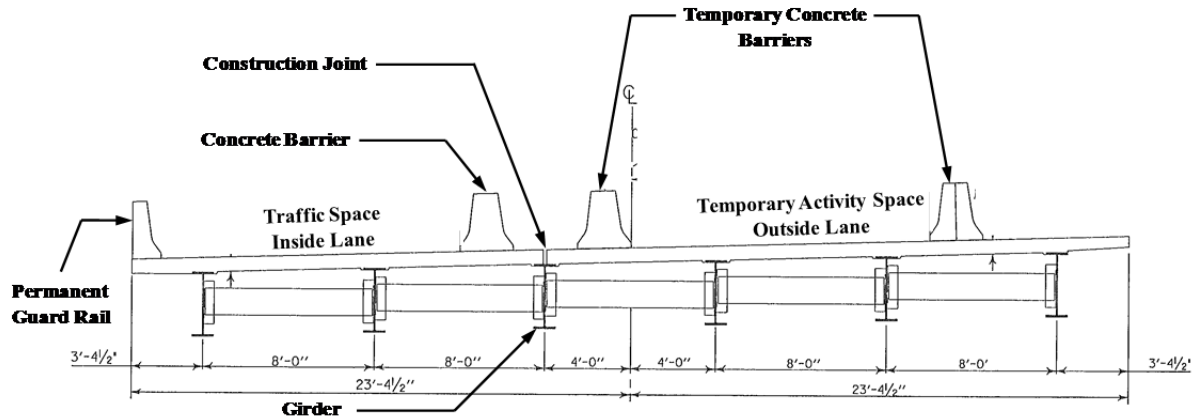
Accelerated Construction Sequencing TTC Concrete Barrier Placement.
